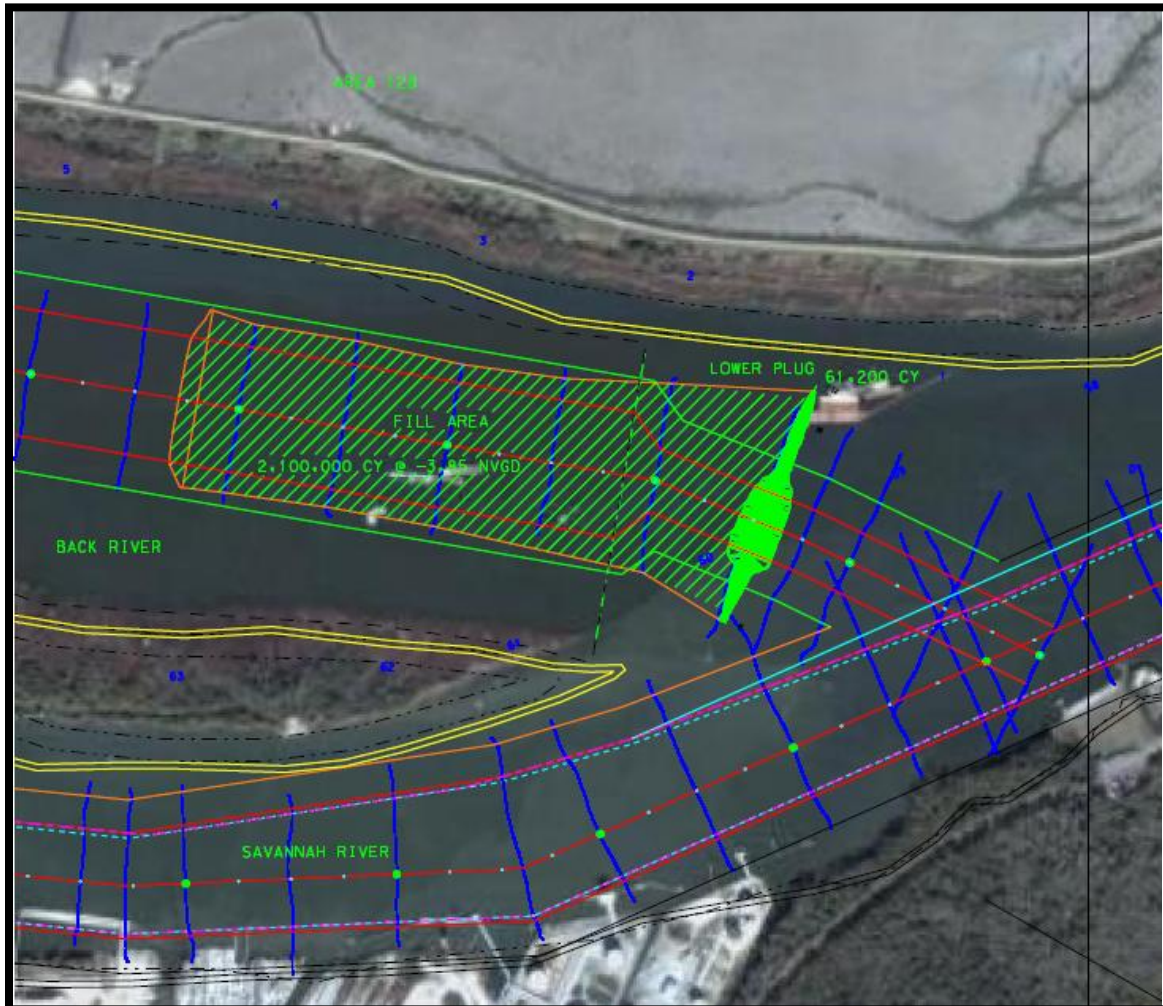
Construct submerged weir across Back River to elevation -3.85 meters MLLW.
